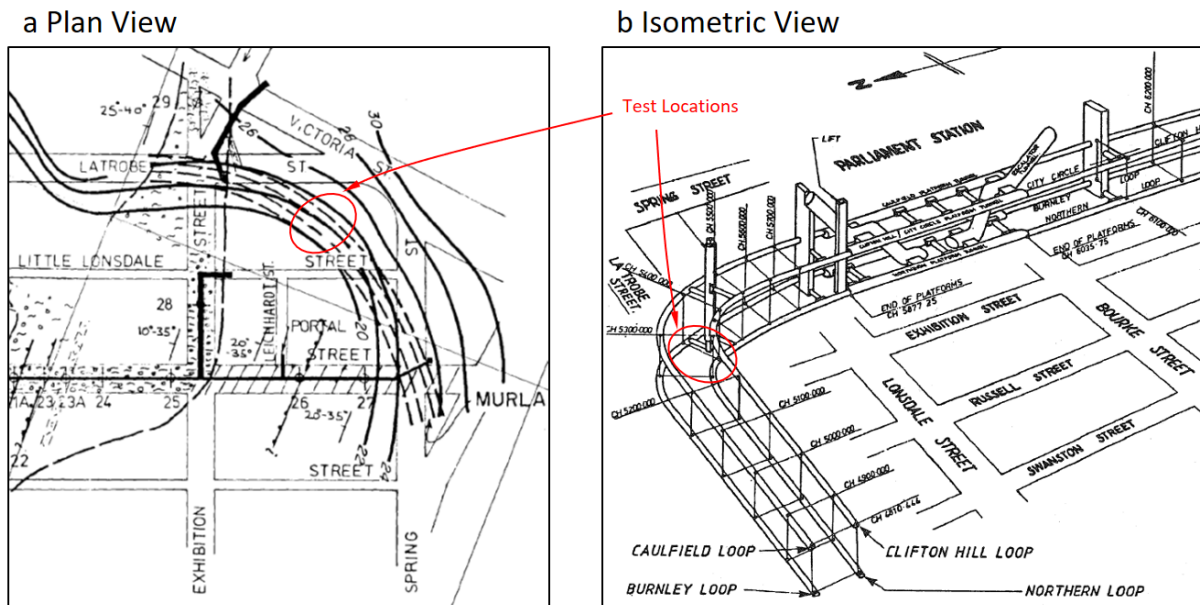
a) Plan view of test location (after, [12]); b) Isometric view (after, [15])
